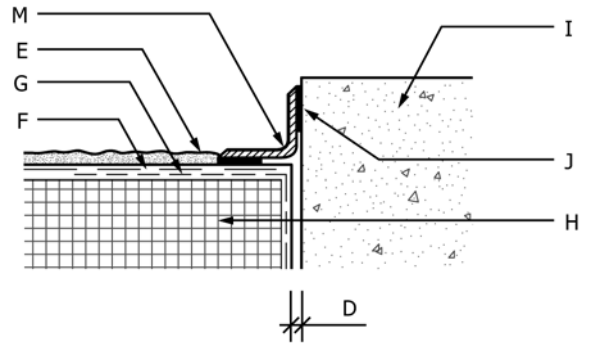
Sealant Fillet Joint Seal Using Precured Sealant
